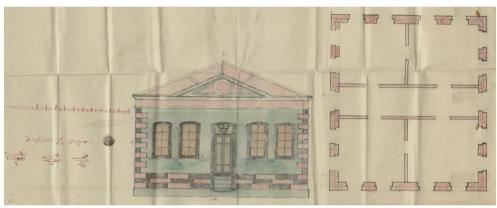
Floor plan and front façade view of the Greek girl's school to be reconstructed, drawn by master builder Andreas V. Petrou, dated 1896 (BOA, SD, 1567-31, H. 18.07.1314, fol. 1).
